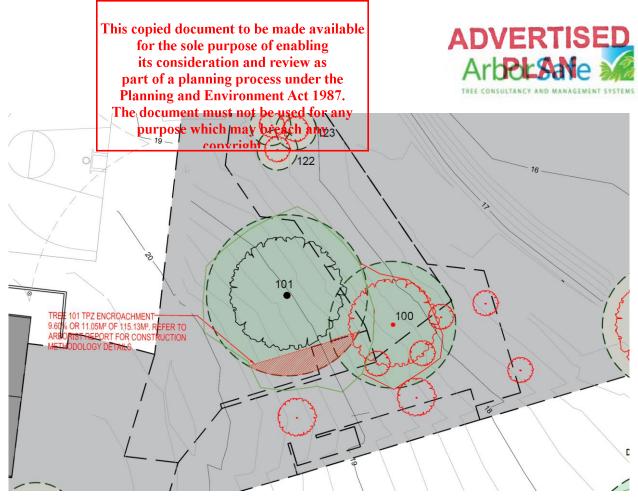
Excerpt from the Tree Protection Site Plan, TP25, Revision C. (Chandler Architecture and Interior Design, March 2020).
